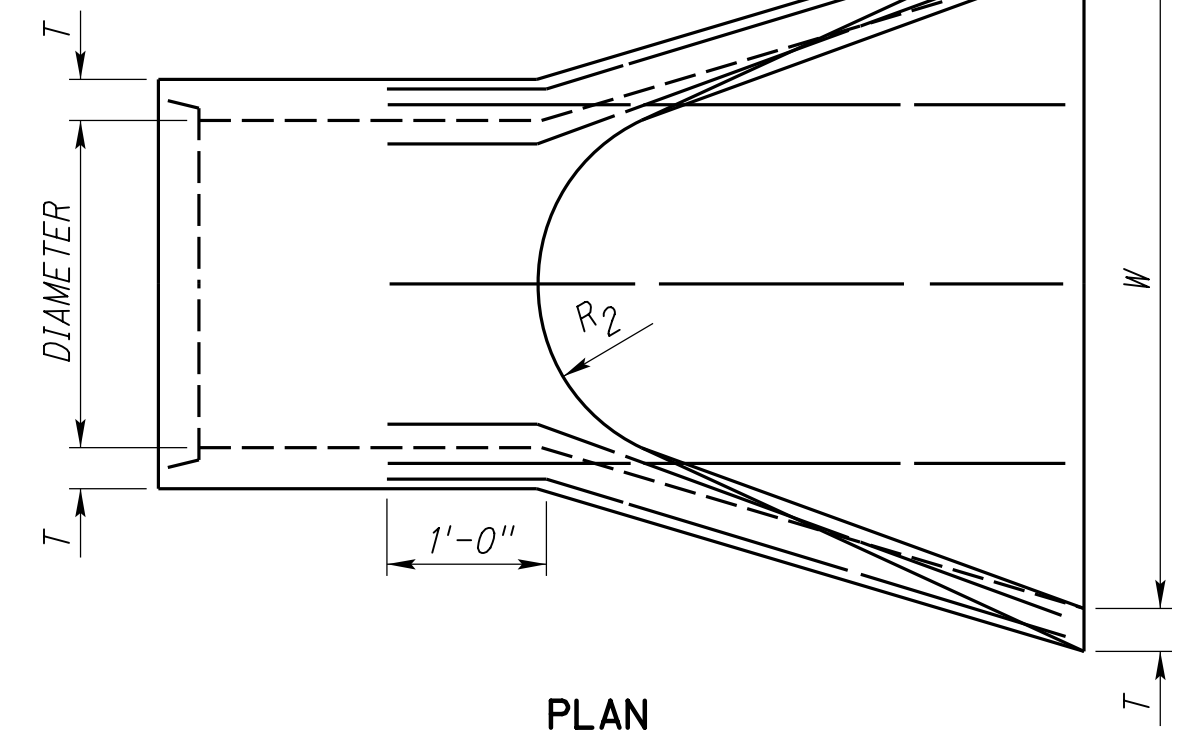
DETAILS OF CONCRETE FLARED END SECTION (FOR REINFORCED CONCRETE PIPE-ARCH)
